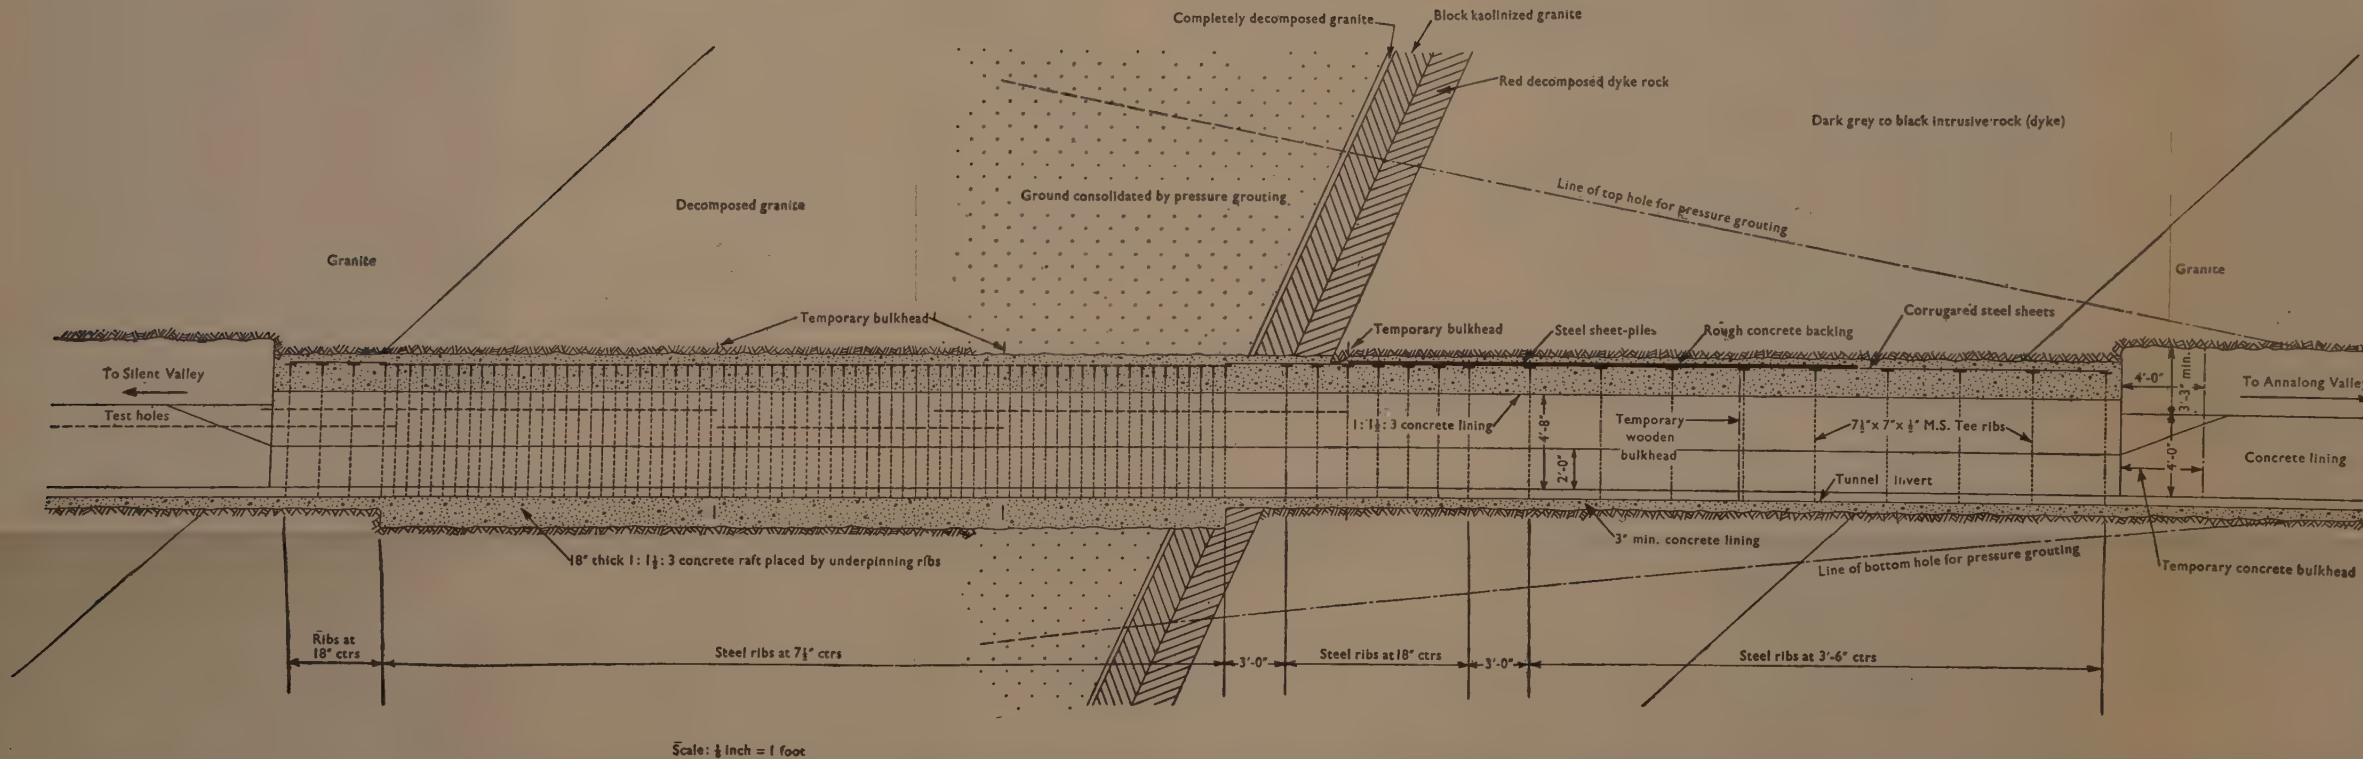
LONGITUDINAL SECTION OF TUNNEL AT FISSURE
